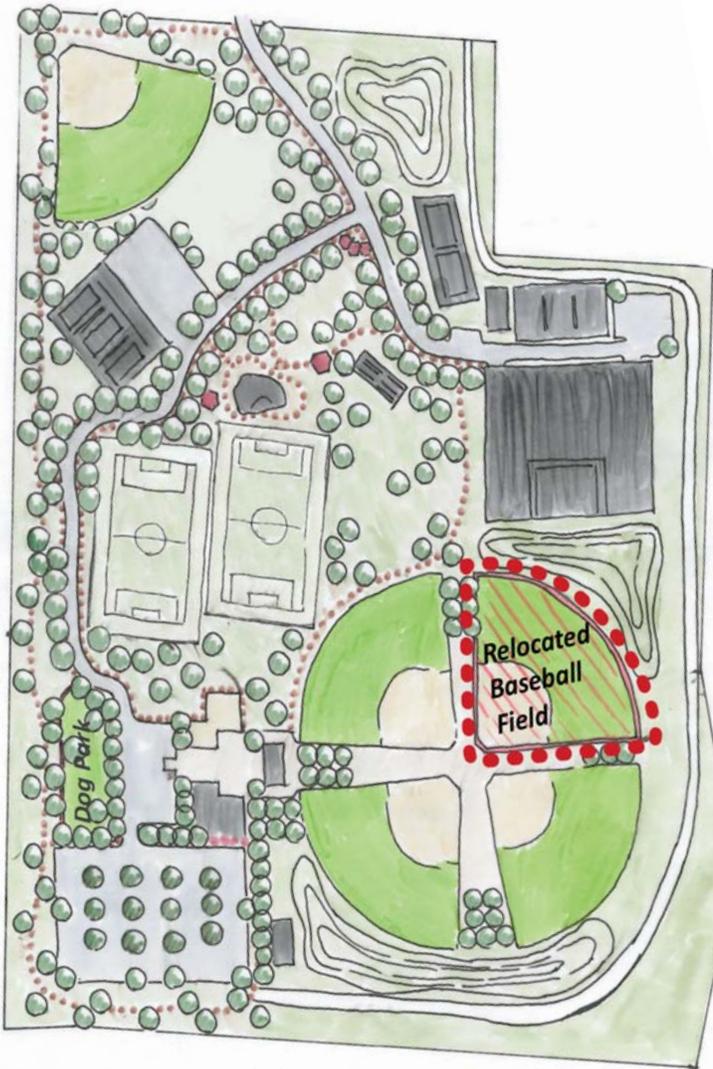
3: Conceptual Plan for Tom Tenorio Park
